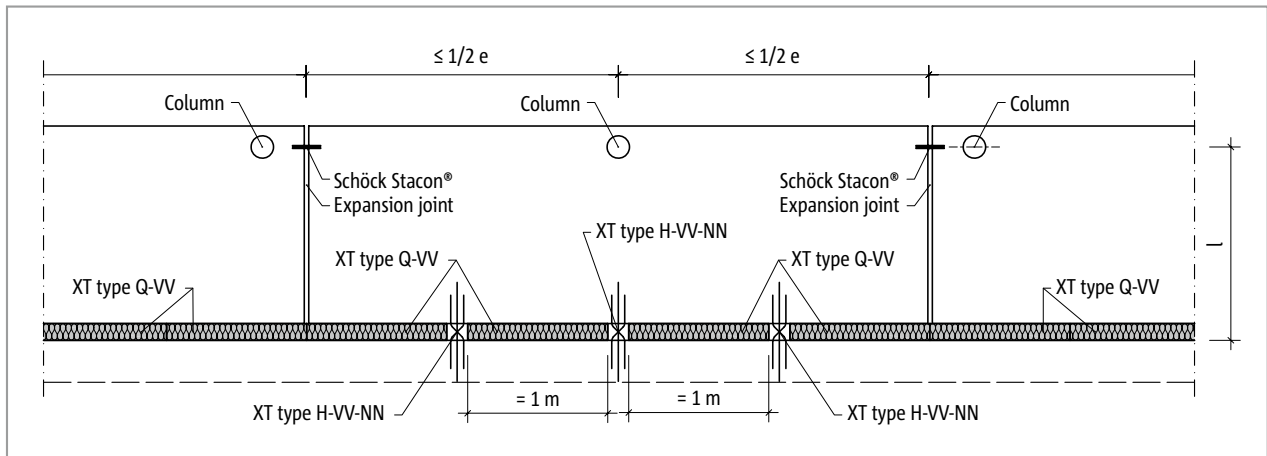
Schöck Isokorb® XT type H: Expansion joint arrangement
